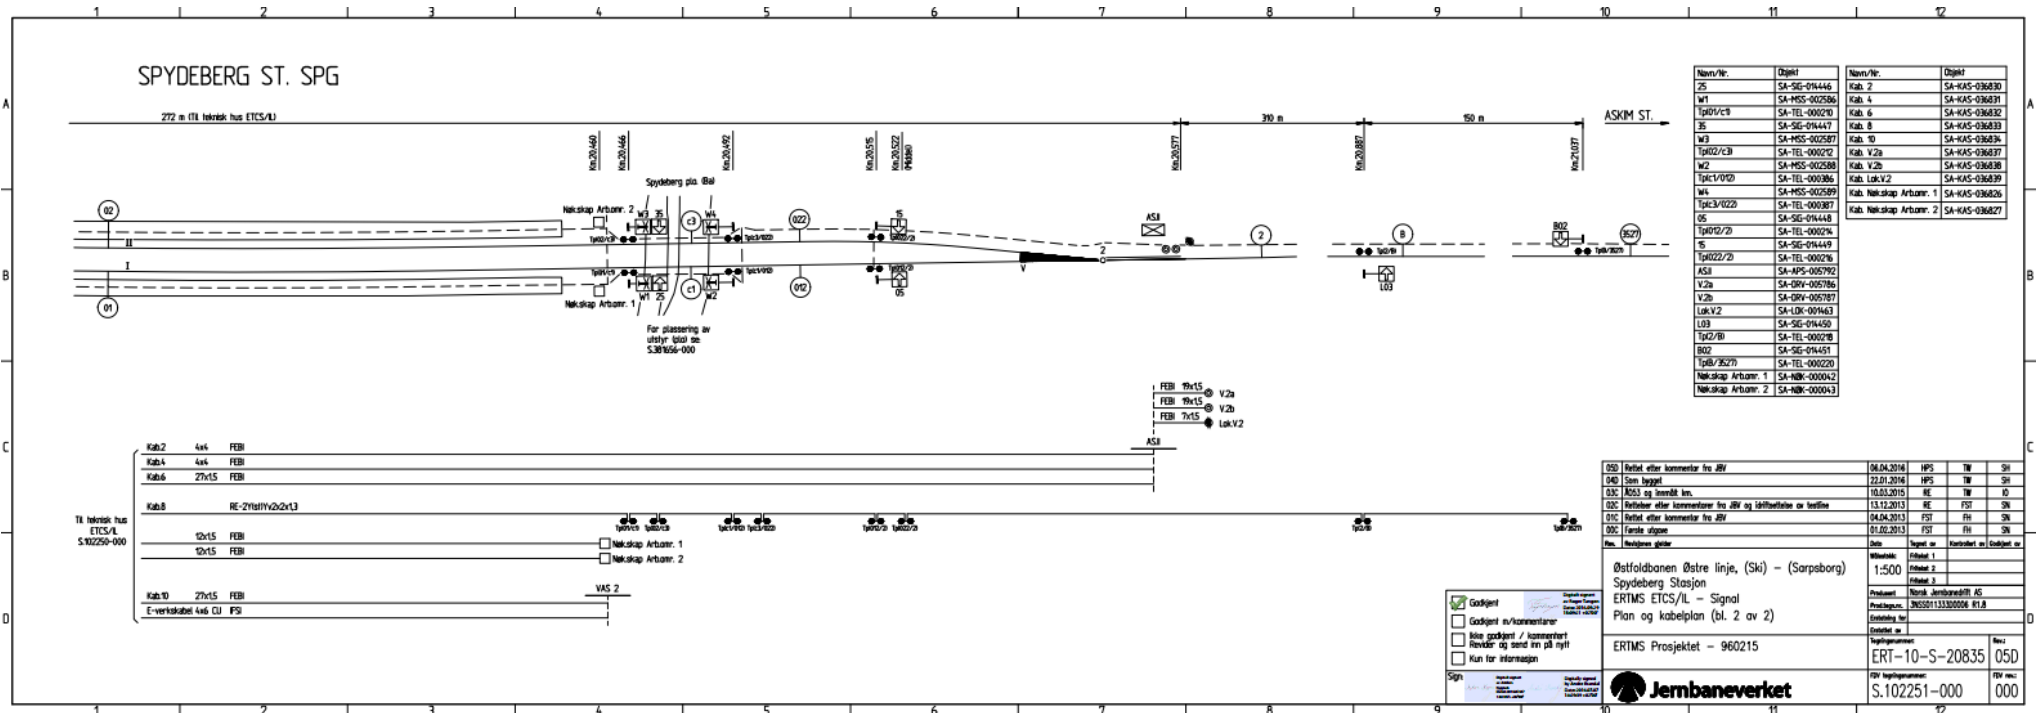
Layout of cable plan at the exit of Spydeberg station
